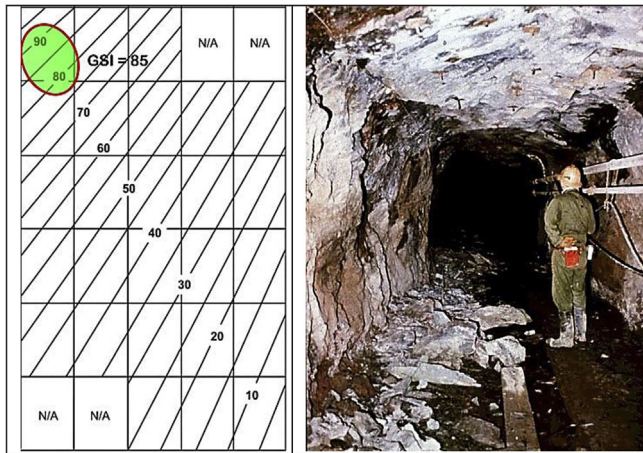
Spalling in the sidewalls of a mine tunnel in intact hard rock subjected to anisotropic horizontal stresses. GSI is not applicable in the analysis of these stress-induced spalls but it can be used for other applications.
